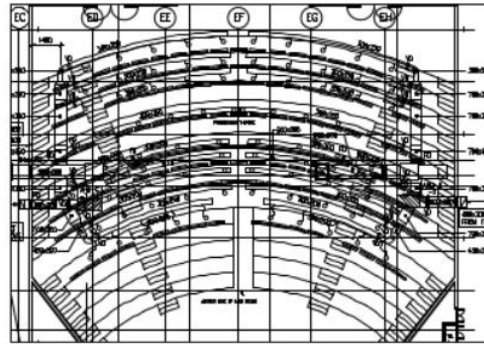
Detailed Plan Drawing for Supply Air Grille Location
